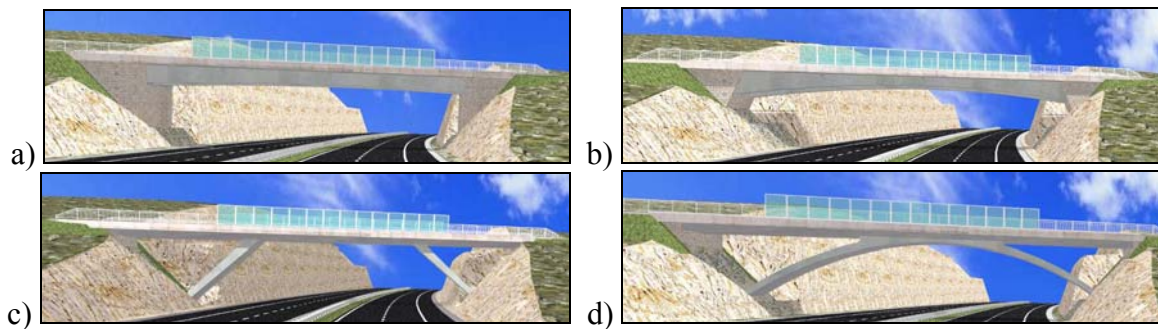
High strength concrete overpass: a) alternative solution 1, b) alternative solution 2, c) alternative solution 3 and d) alternative solution 4
